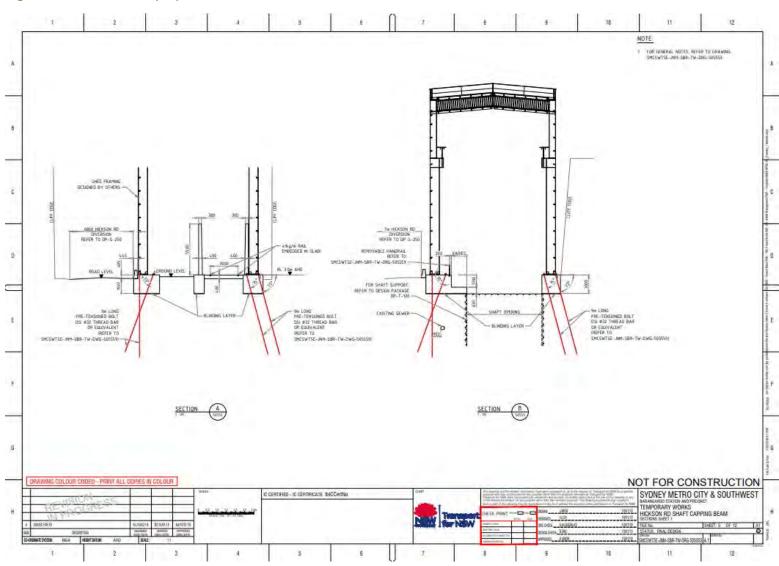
Sections of the proposed acoustic enclosure on Hickson Road
